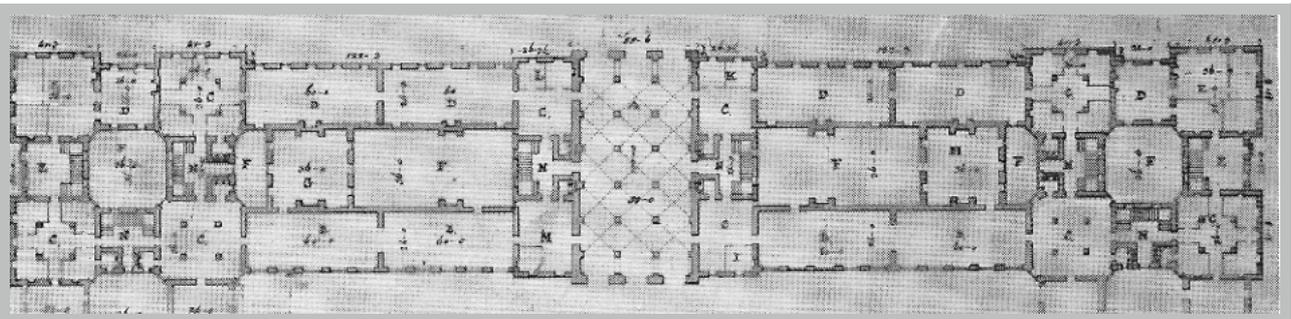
Jacobsen's Plan of 1756, as built, with "Additional wings, ordered to be built..."
